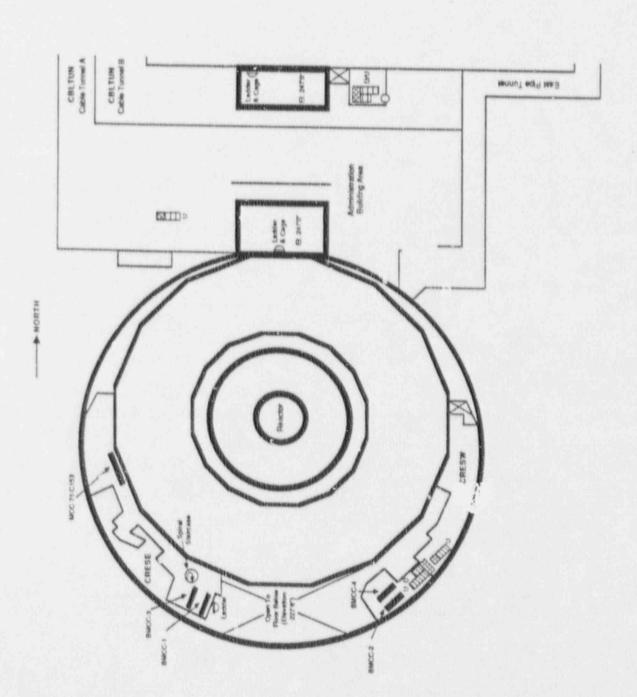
Reactor Building, Elevation 242'6", and Administration Building, Elevation 260'0"
